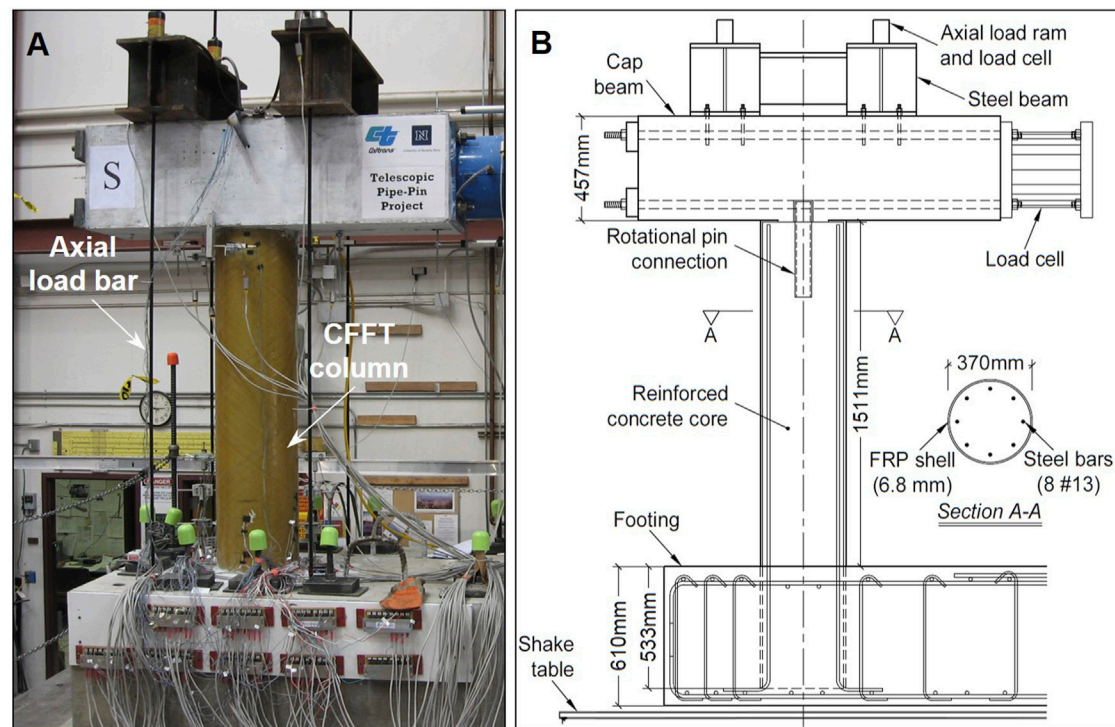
| (A) Experimental test setup showing CFFT column on the shake table prior to testing and (B) structural detail including components of the test setup and internal steel reinforcement.
